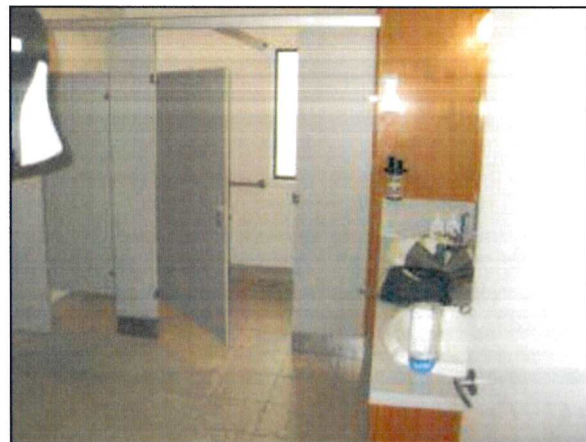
Fire Station #4* A general view of the restroom off the game room.
